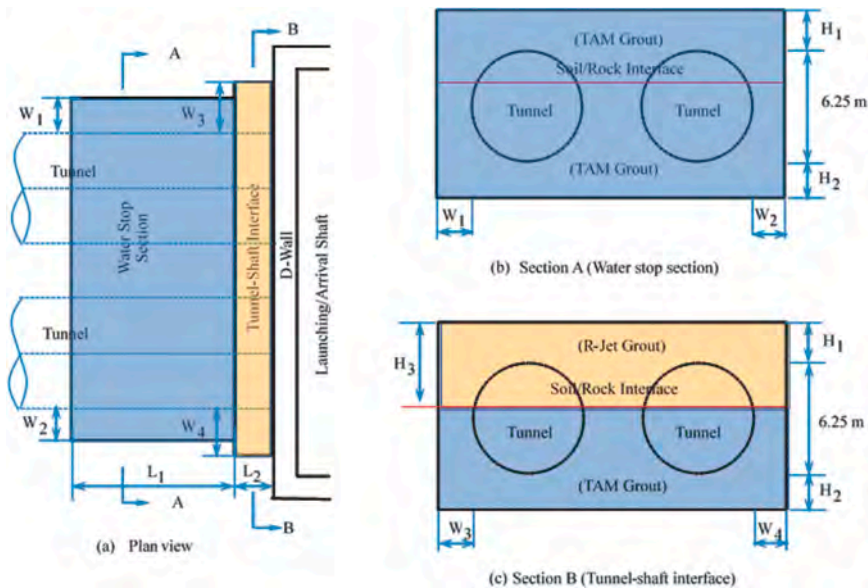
Grouting plan and profile for launching and arrival shield of the study case (Chen et al., 2020).
